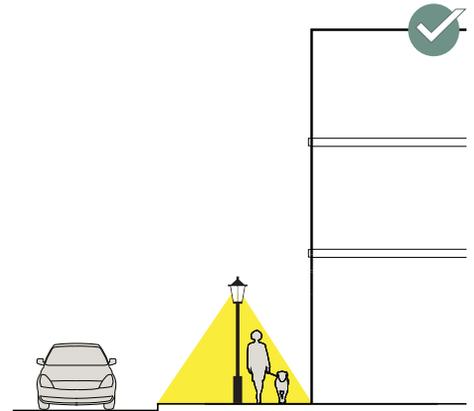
Use a small-scale fixture with down-lighting or light bollards to illuminate a pedestrian walkway.
